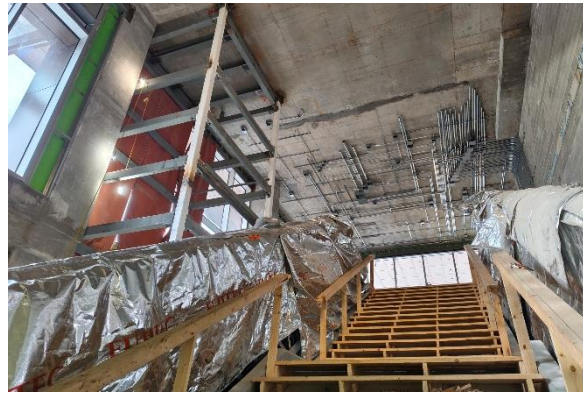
South Granville Station: Progressing with installation of the elevator steel frame at the station entrance.
